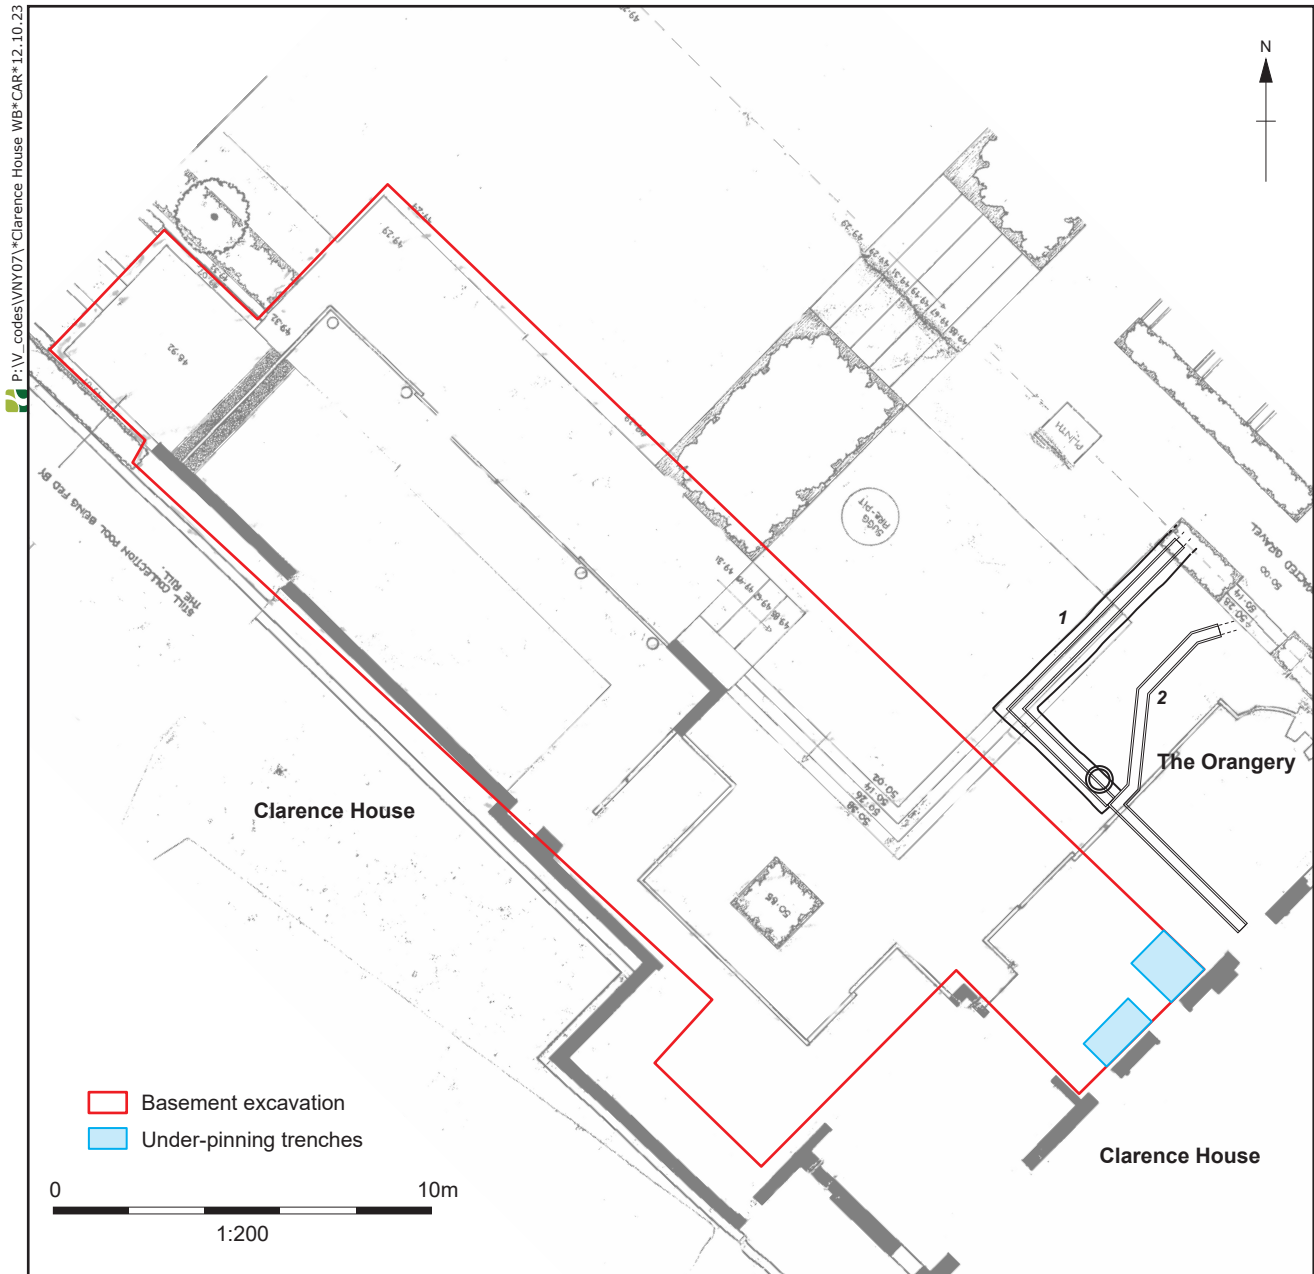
Plan showing location of basement excavations, underpinning trenches and the site of the orangery
